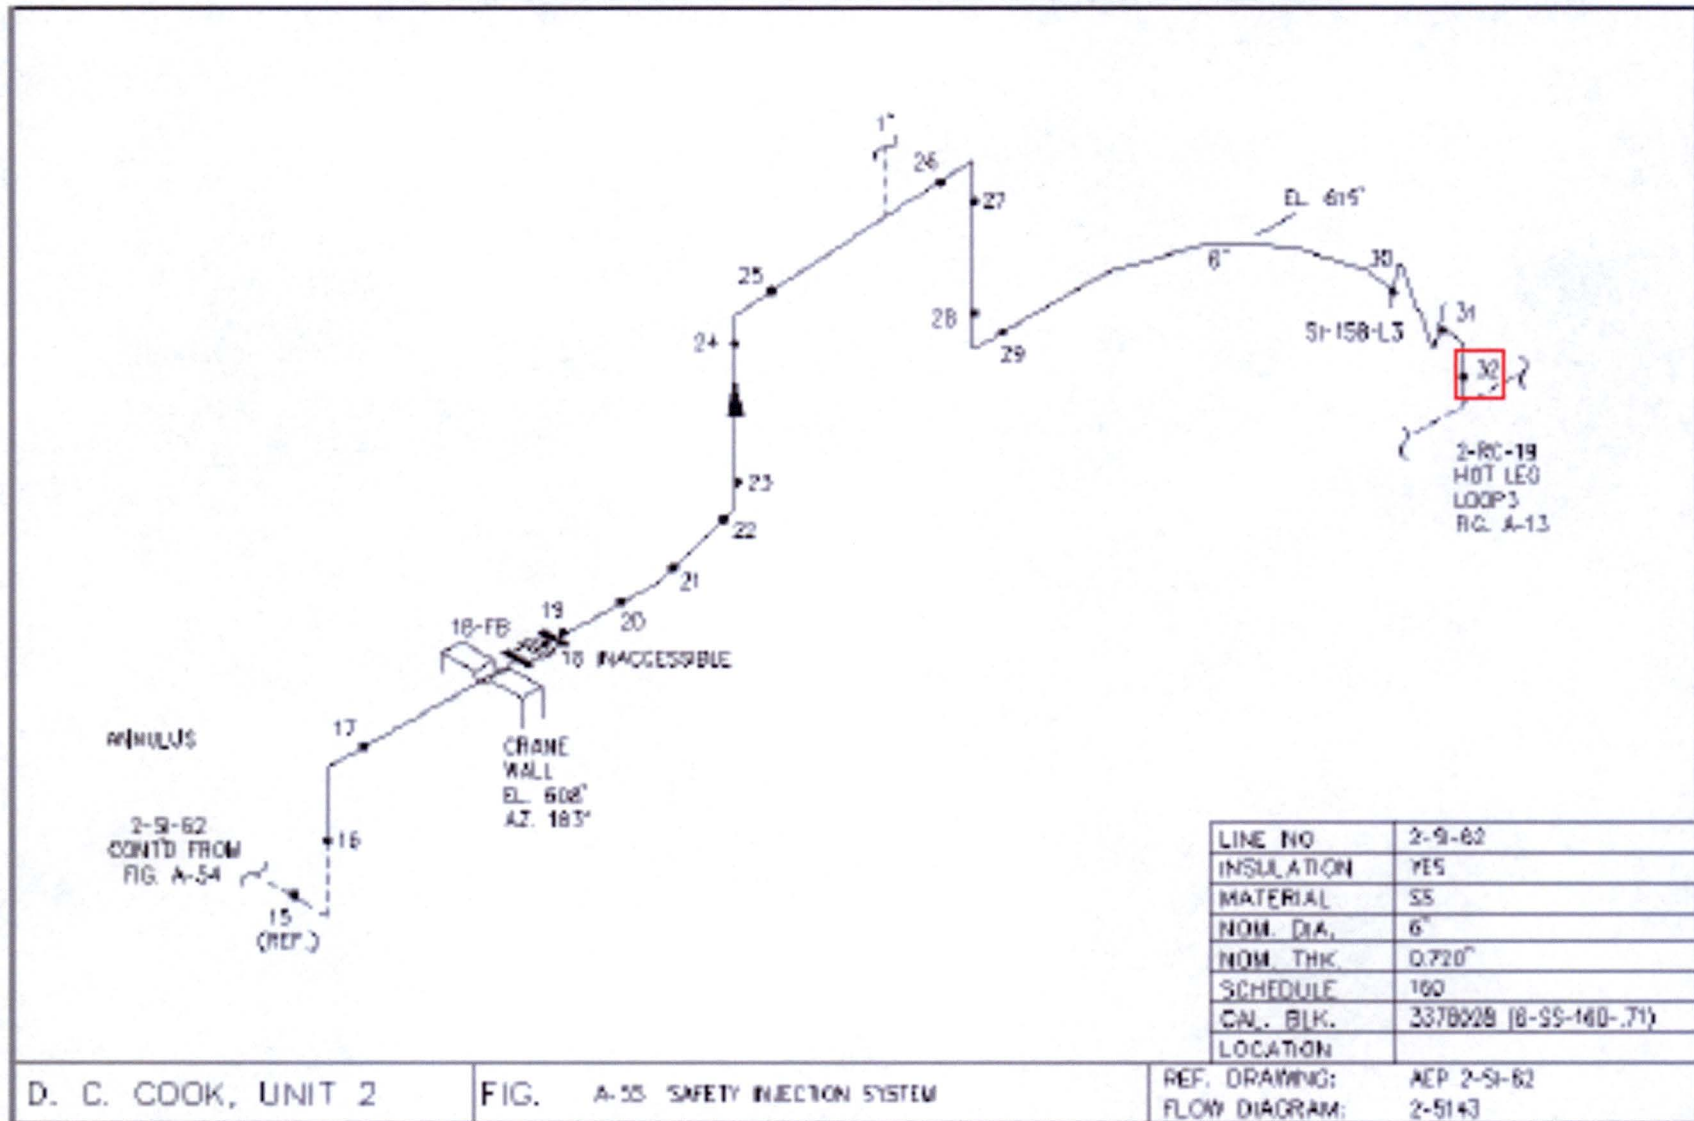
Weld 2-SI-62-32 (Extracted from Reference DRAWING 2A-55)
